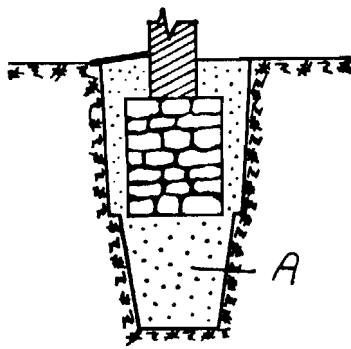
Sand Fill for Sides and Base of Building Foundations
